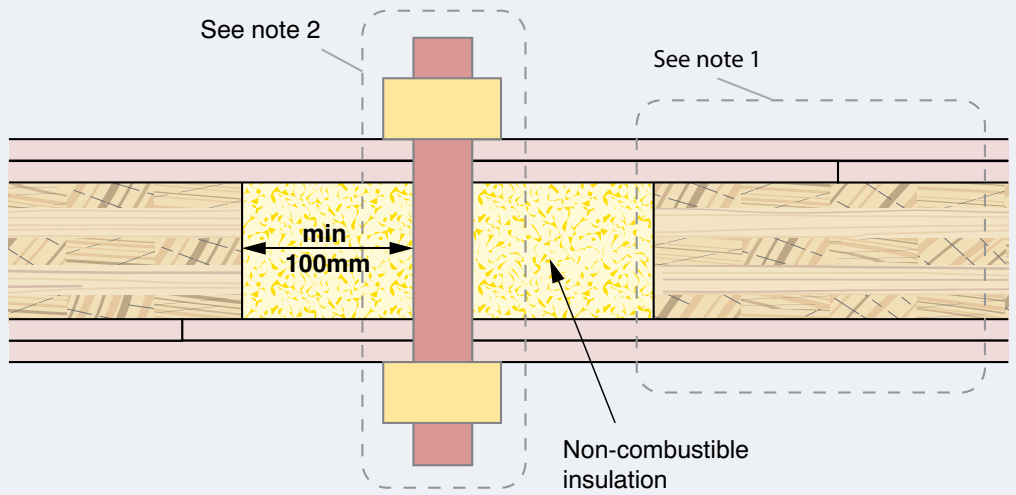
Plastic pipe penetration through fire-protected massive timber walls with non-combustible mineral fibre insulation.
